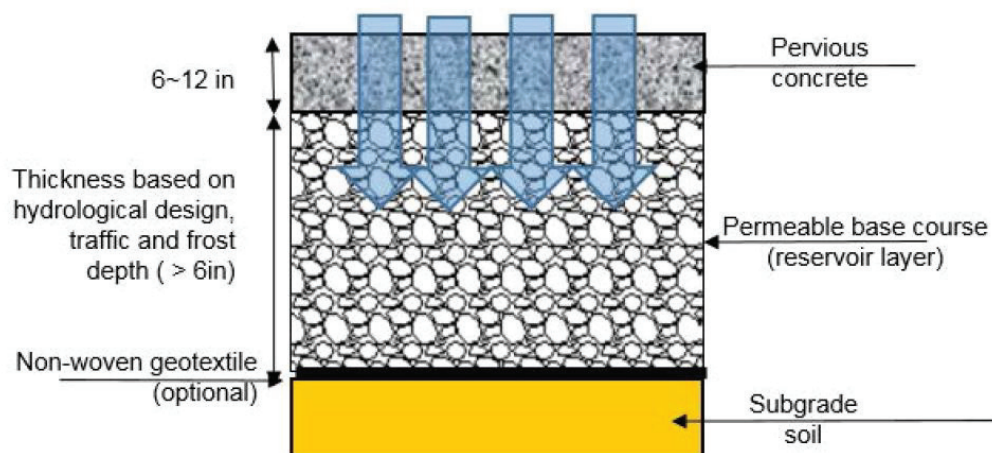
Typical cross section of a pervious concrete pavement (Source: [36])
